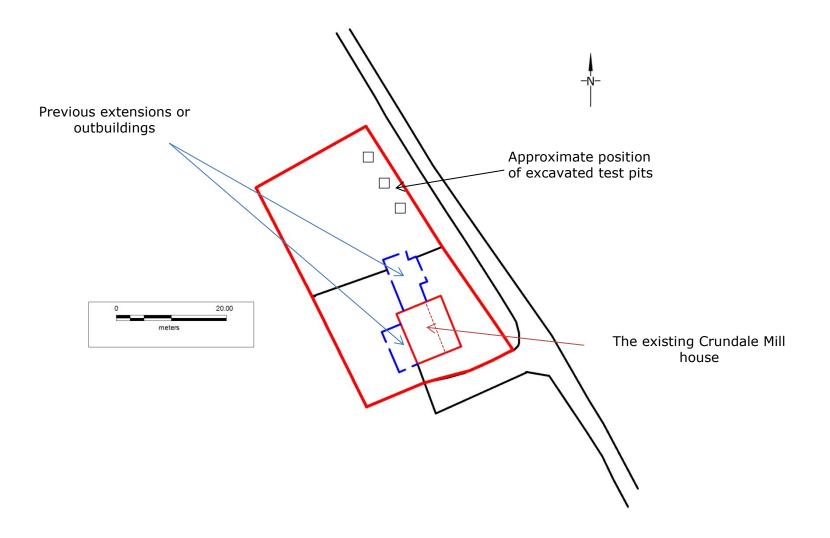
Plan of the existing footprint of Crundale Mill house showing the approximate position of the test pits excavated in field to the north.
